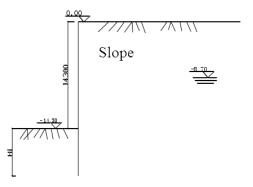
Calculation sketch of soil pressure on the south side slope of foundation pit.
